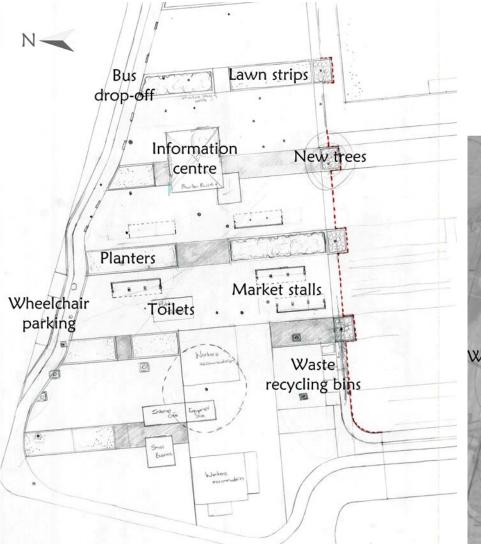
Sketch Plan development 2 (Author, 2012)
